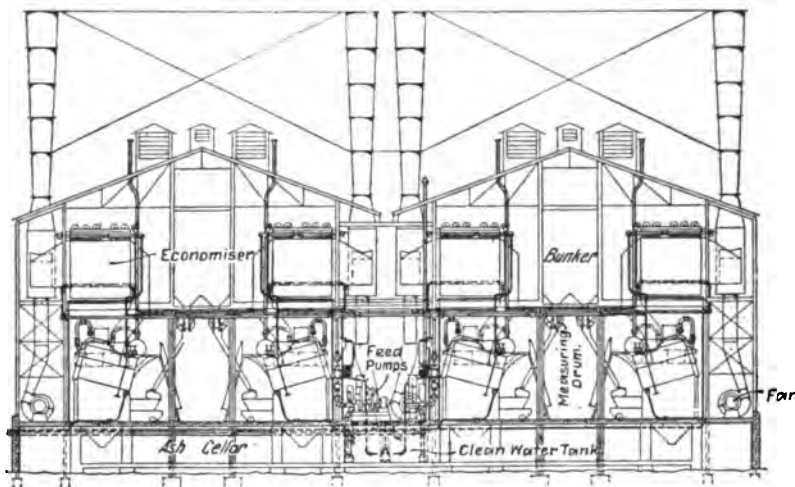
Simmerpan Power Station. Section through Boiler Houses.
